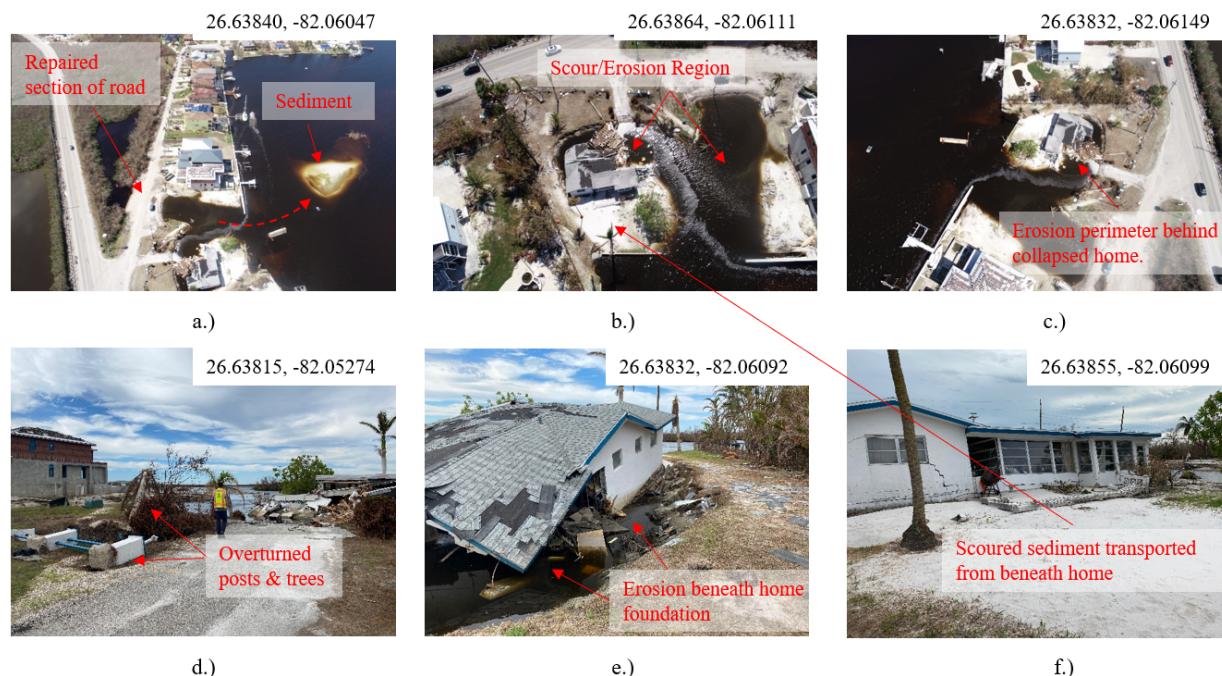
Damage and erosion near the intersection of Shoreview Drive and Pine Island Road in Matlacha: a.) drone image of repaired section of roadway and accumulation of sediment on shoal beyond failed retaining wall indicating likely direction of high water flow; b.) scour and erosion of lawn between new home under construction (right) and collapsed home (left); c.) erosion behind collapsed home; d.) overturned posts and trees potentially indicative of direction water flowed; e.) scour and erosion beneath foundation of collapsed home; f.) front of collapsed home and eroded sand sediment piped from beneath home to front lawn potentially indicating direction of water flow.
